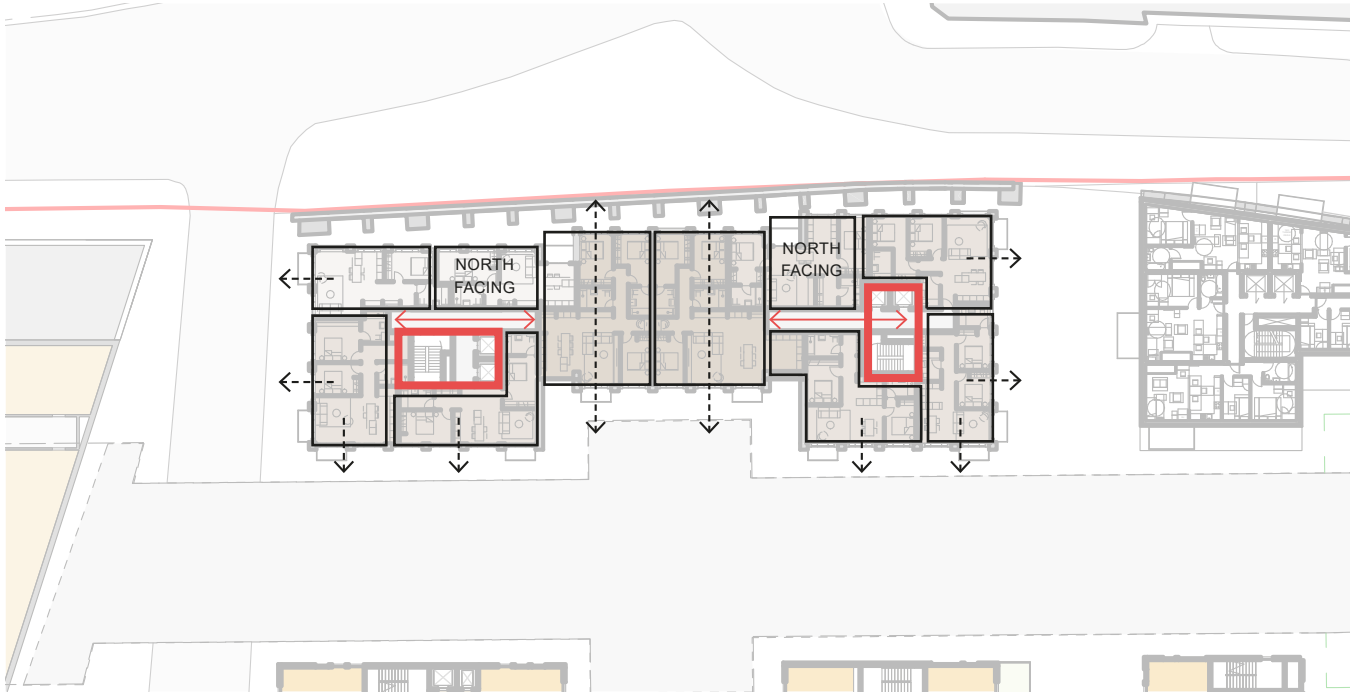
Proposed strategic internal layout (typical upper plan)
